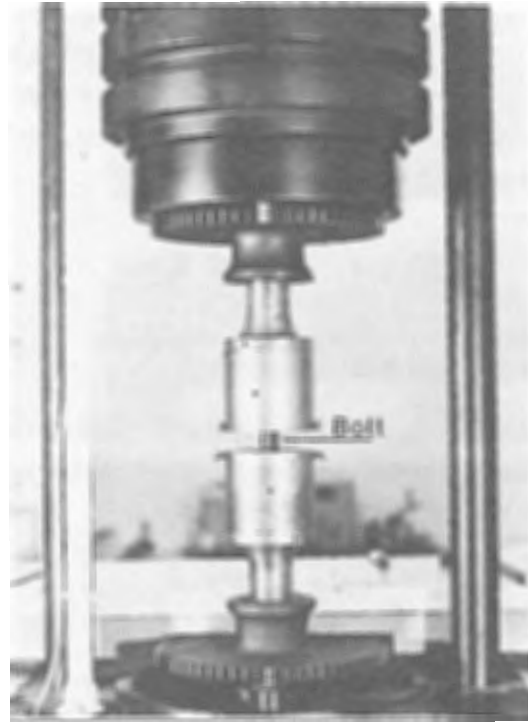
Fatigue test of bolt using Vibrophore fatigue machine.
